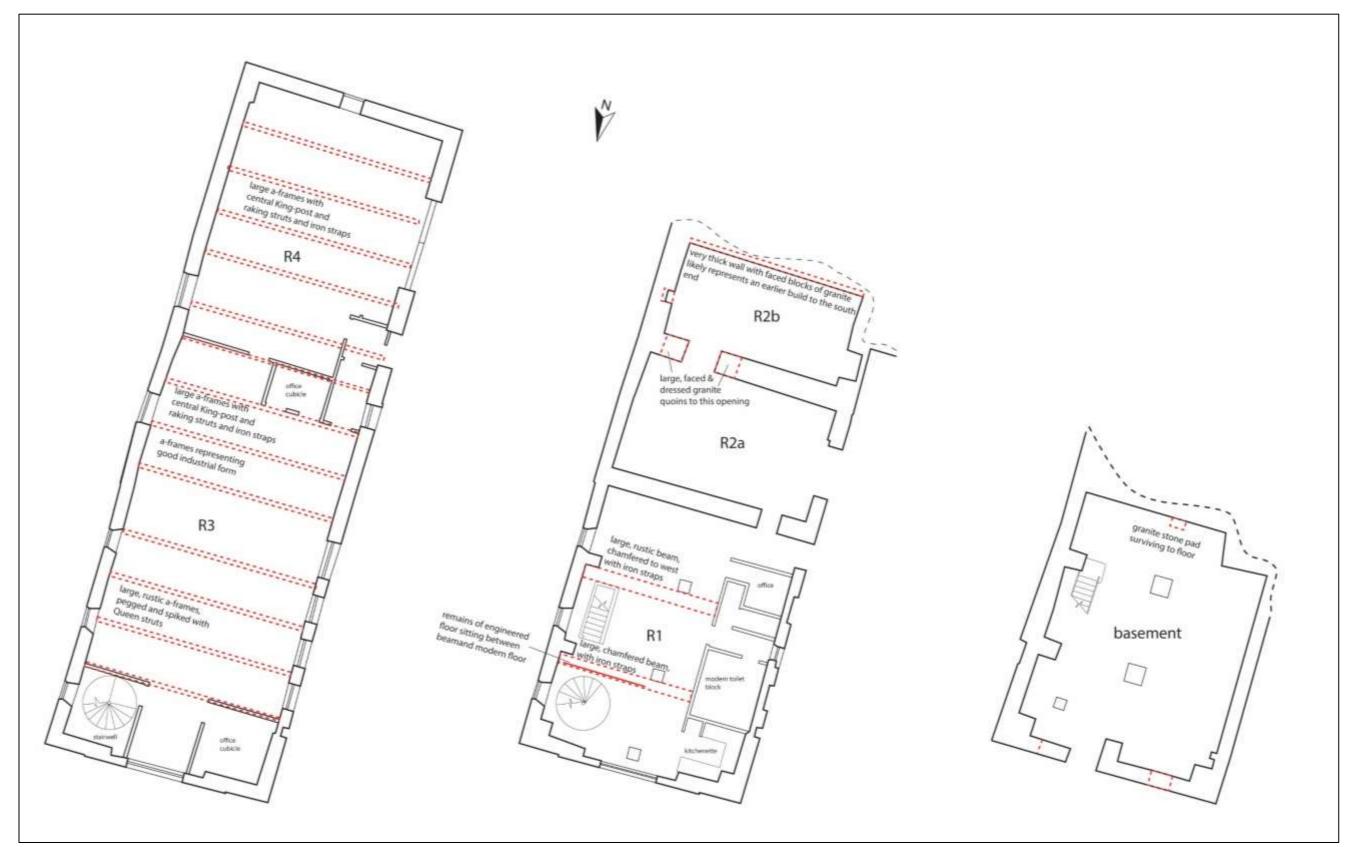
BUILDING PLAN OF THE HOUSE, SHOWING ROOM NUMBERS AND SIGNIFICANT FEATURES, NOT TO SCALE.
